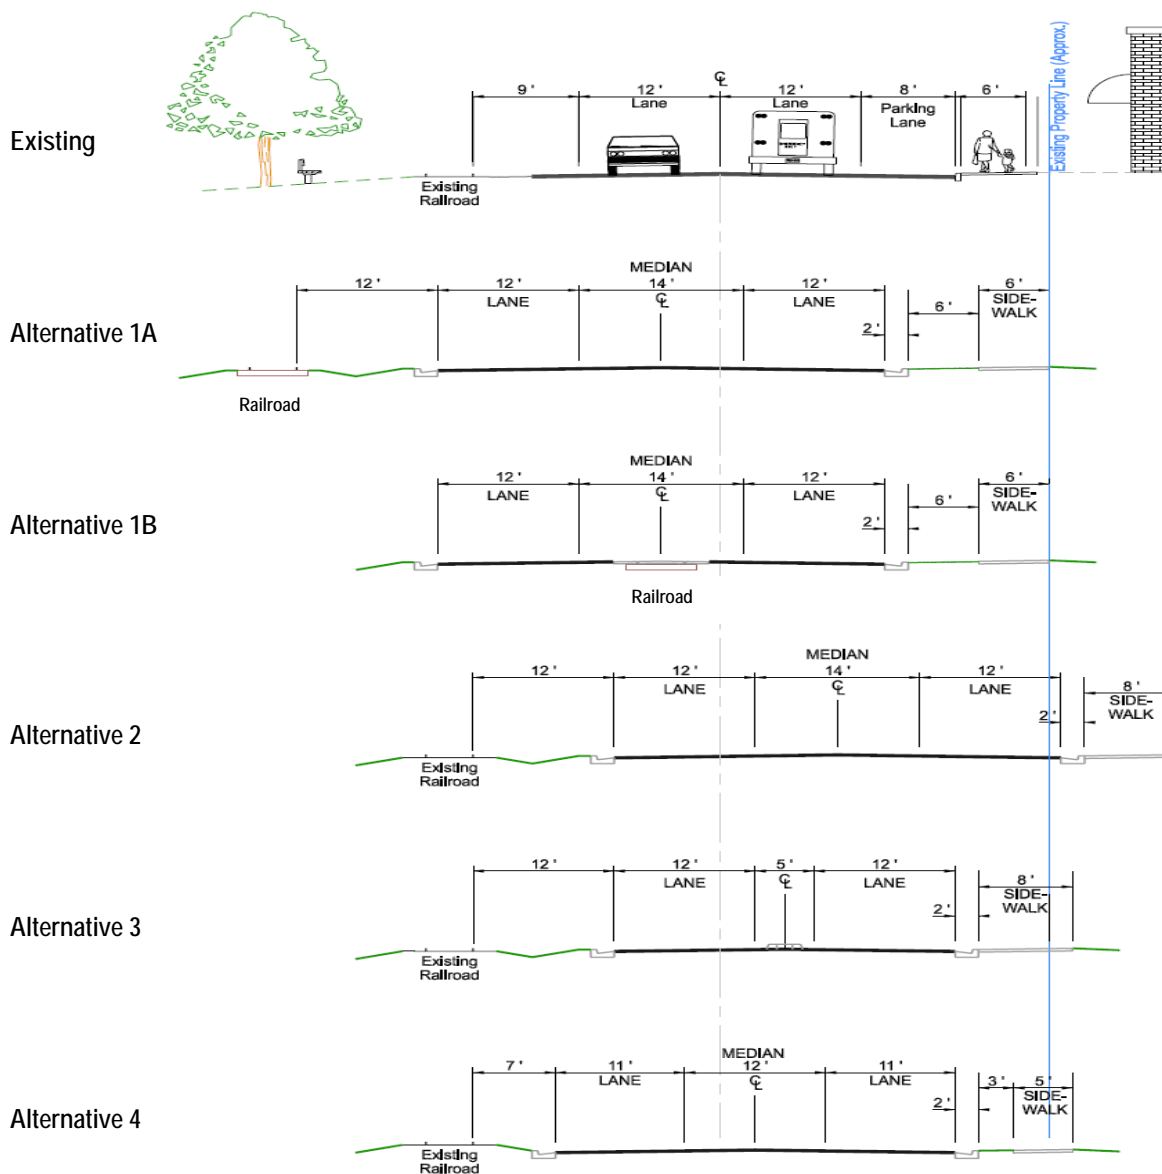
Comparison of Typical Sections for Existing and All Build Alternatives for Section 3
